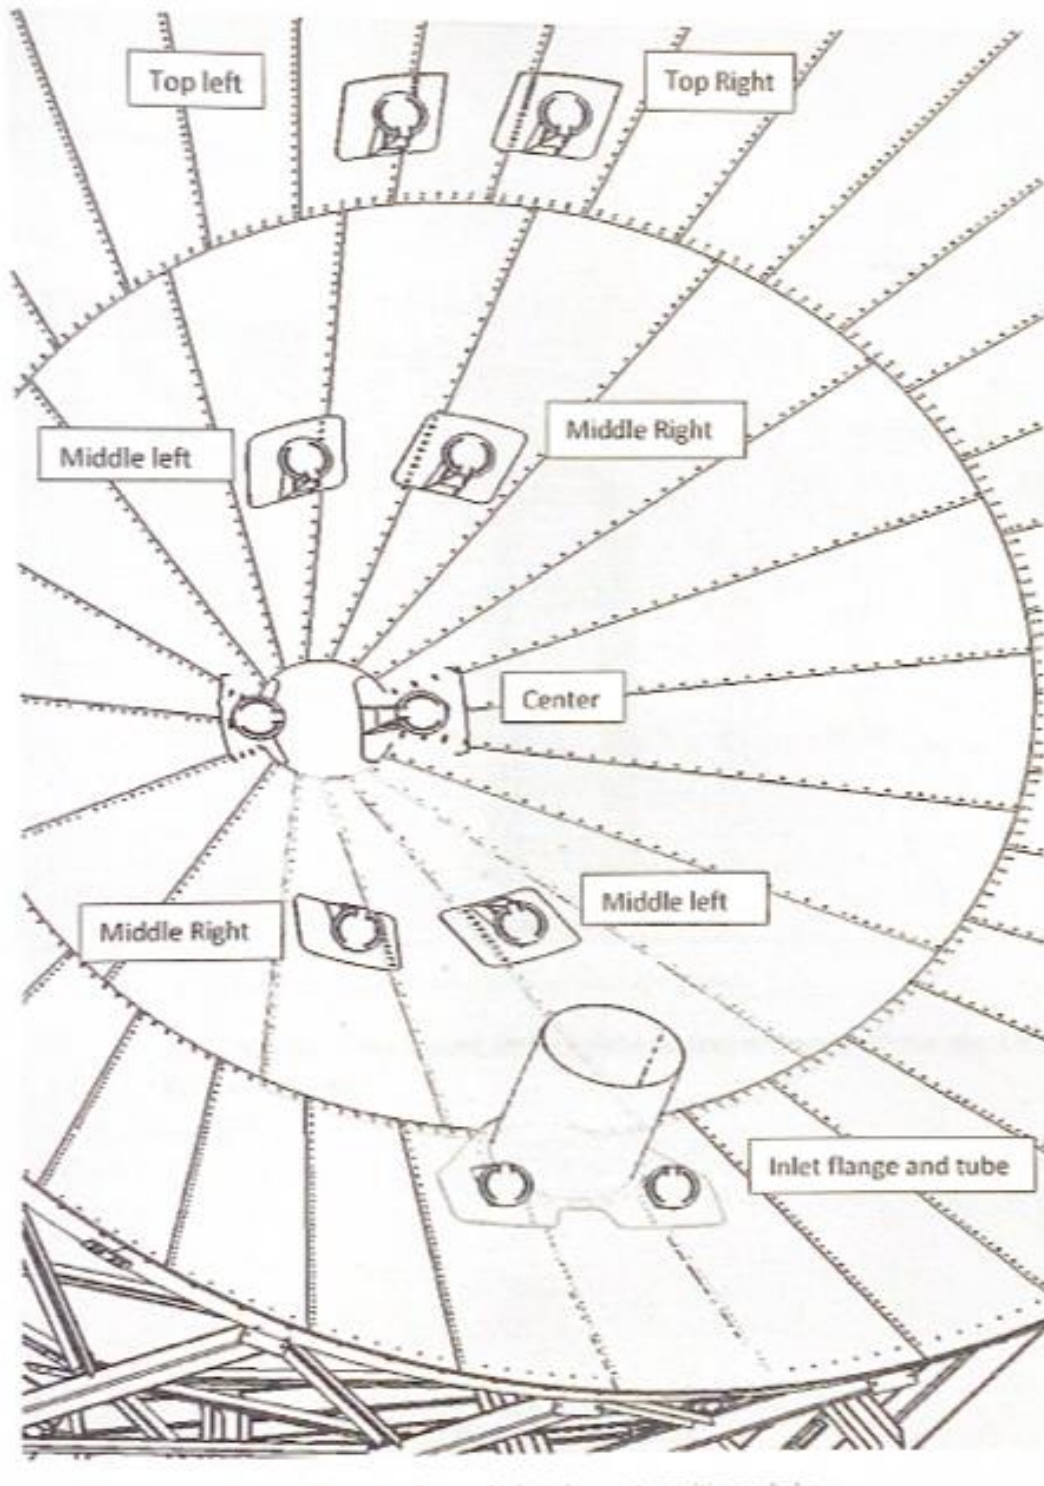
Install aeration feet and inlet tube – note position on holes.
